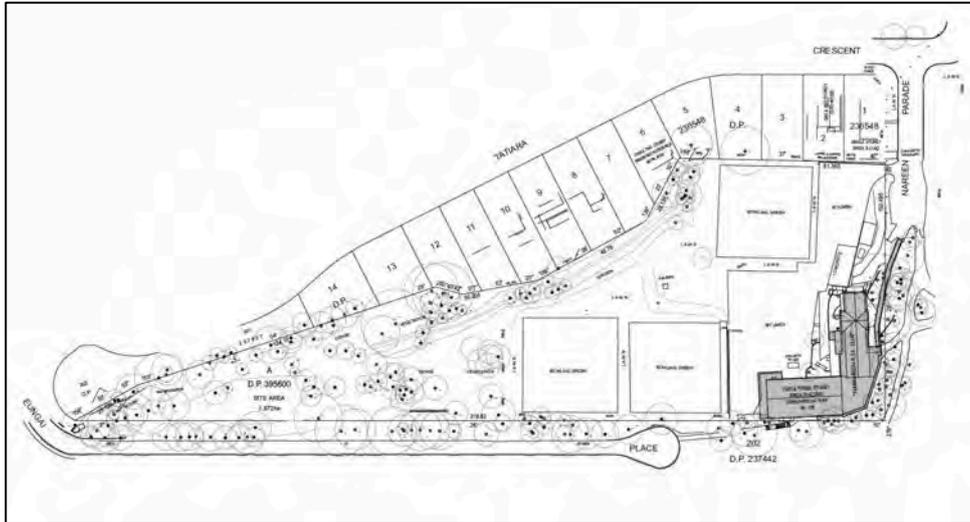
The existing layout. (Source: Existing Site Plan by elo architecture Rev 1 dated 23/01/2025)
